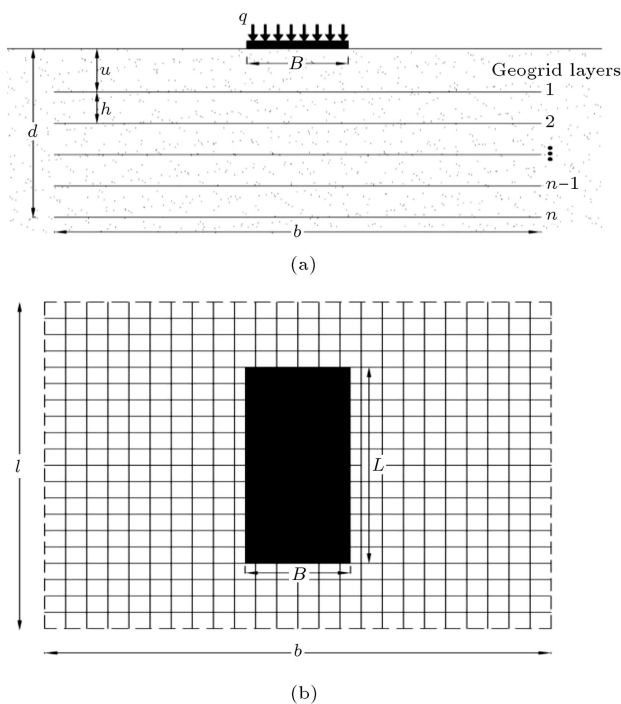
Geometric parameters of a strip footing on geogrid-reinforced soil: a) Section; and b) plan.
